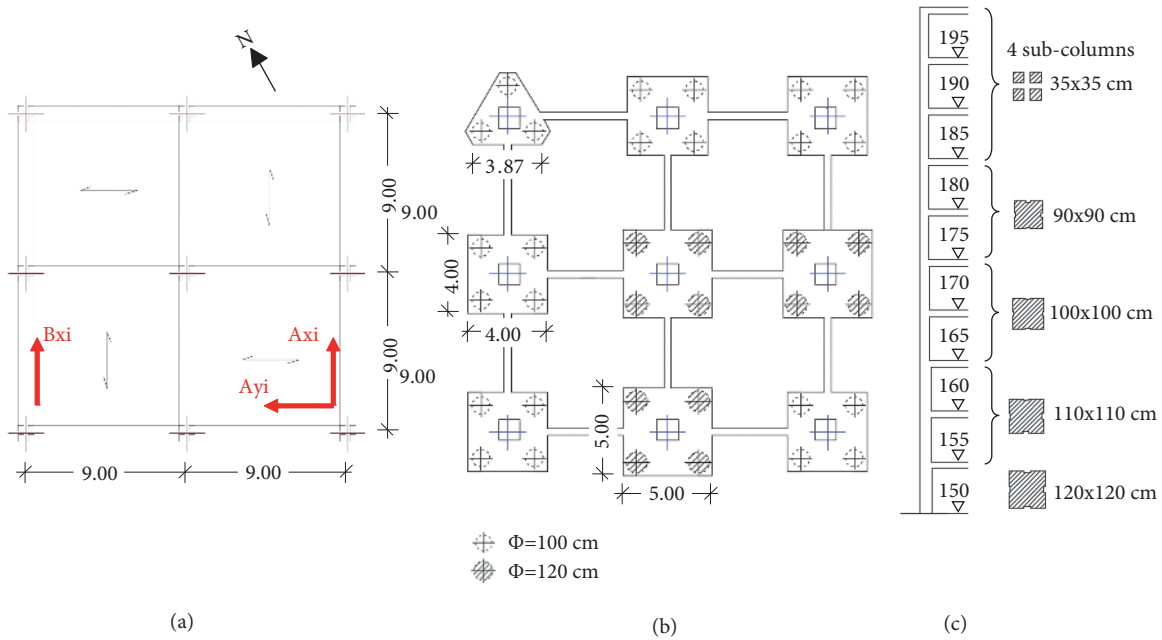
(a) Typical floor plan, (b) foundation layout, and (c) columns cross sections.
